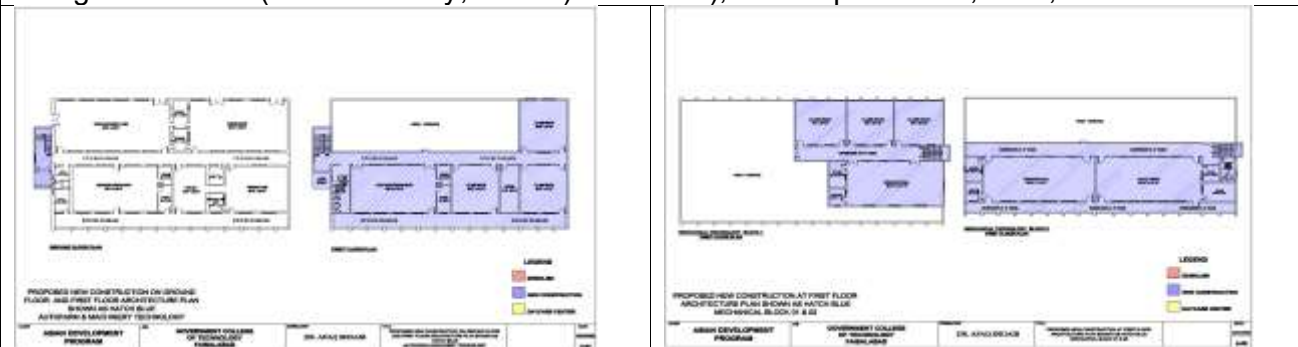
A: Designed layout plan for Ground floor, GCT Faisalabad (Blocks below show the designed facilities)
